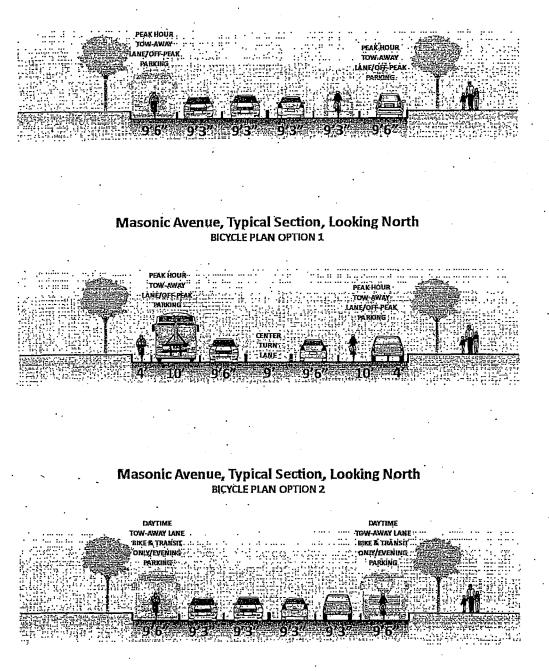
Project 3-2 Existing Conditions & FEIR Bike Plan Options Cross-Sections
